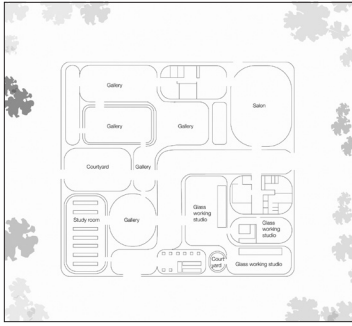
Plan of the Glass Pavilion, the Toledo Museum of Art. Drawing by the author.
